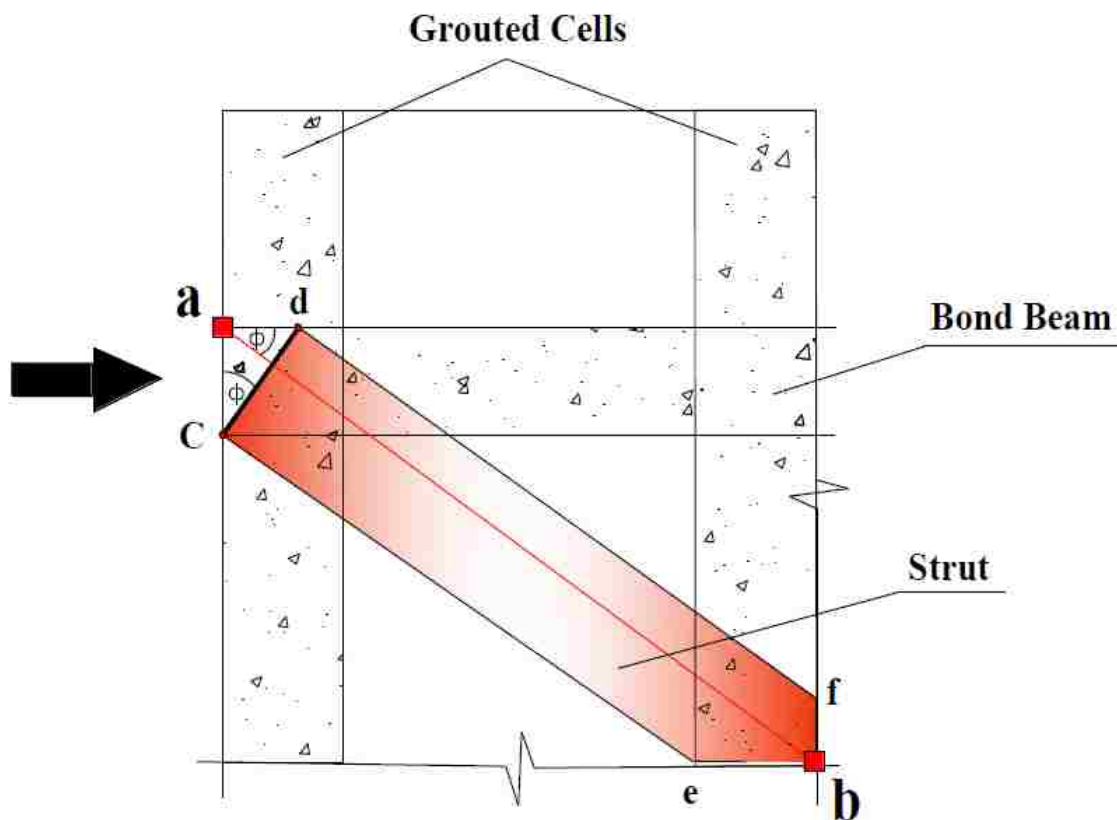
Wall Strut Calculation for Partially-Grouted Shear Walls (Elmapruk 2010)
